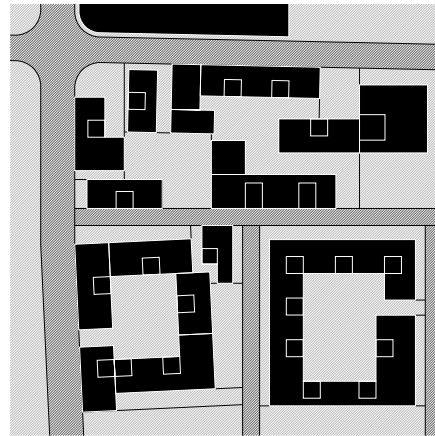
Aerial View of Typical Mid-rise Apartment Building Type
